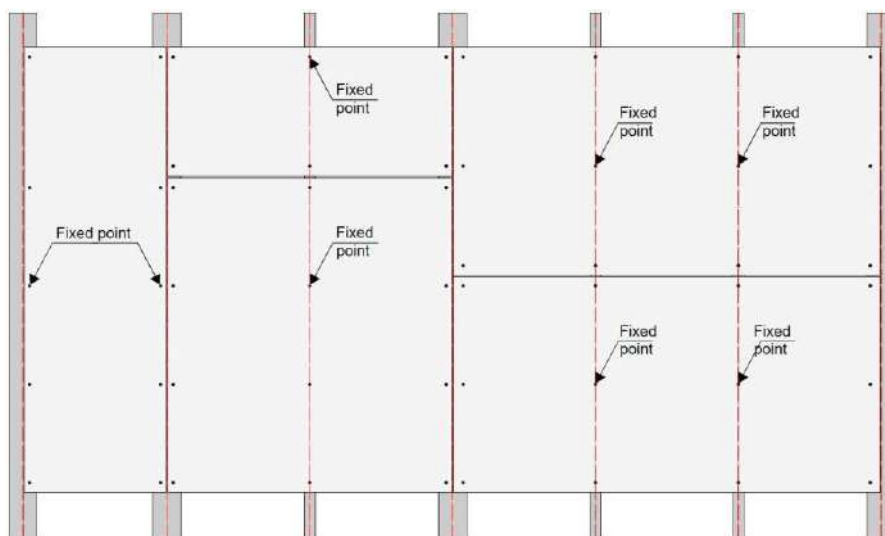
Example of cladding with Silbonit fiber-cement panels. In some cases, the geometry of the panel and the facade layout may require two fixed points.
